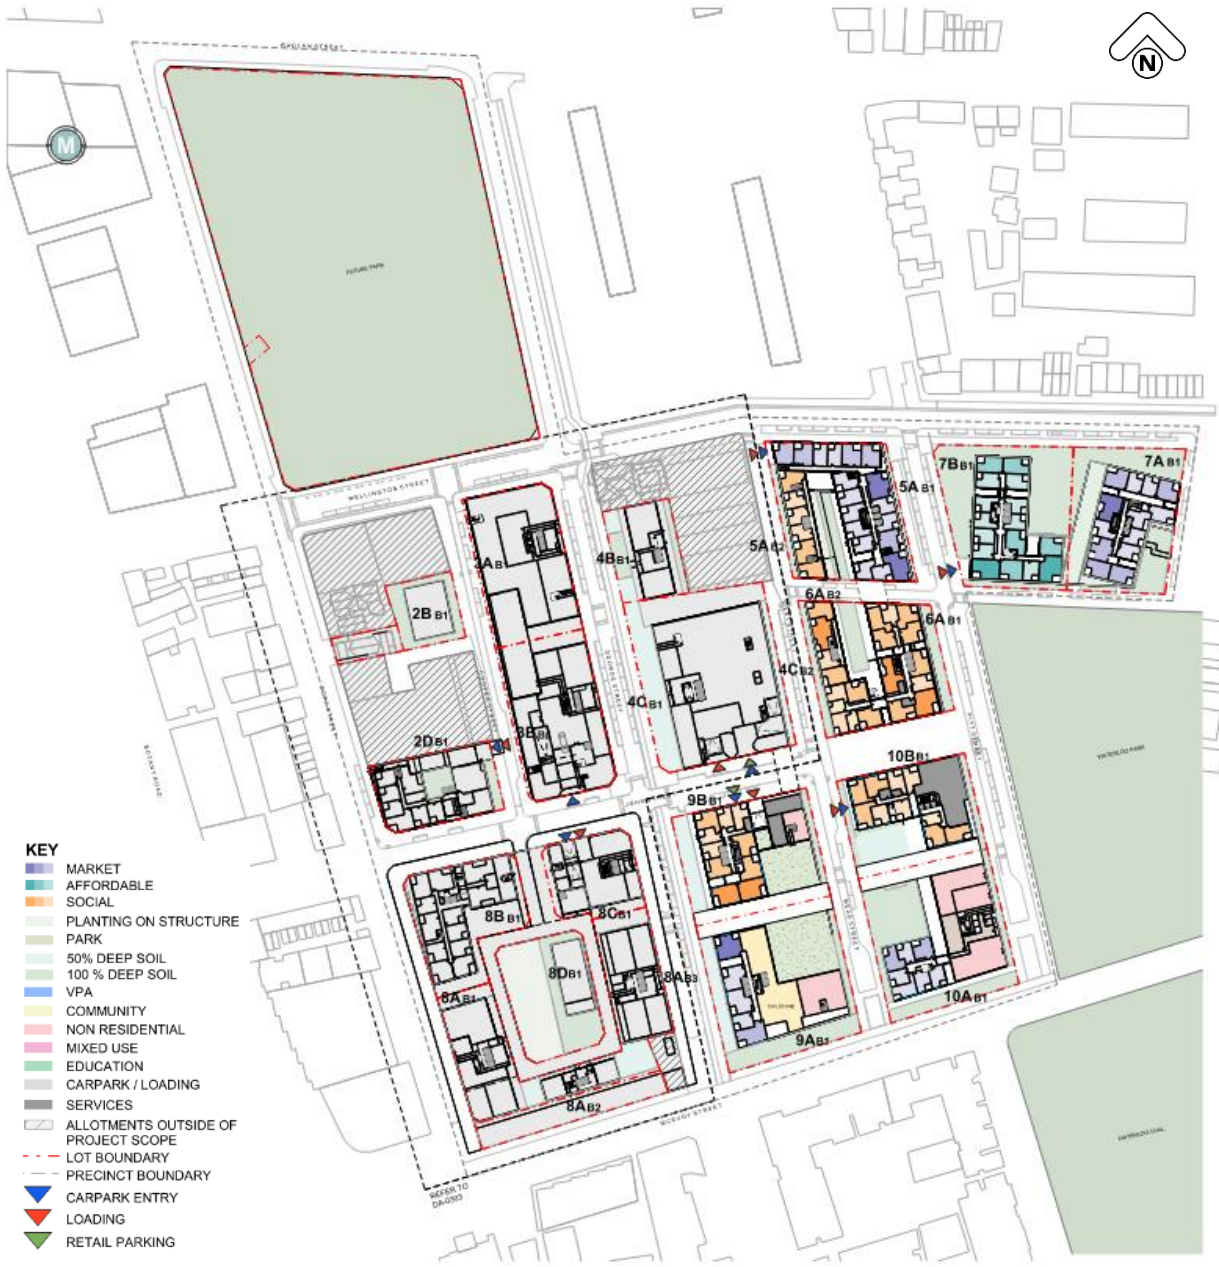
Indicative Planning Proposal Precinct Plan (Source: SJB Architects)
